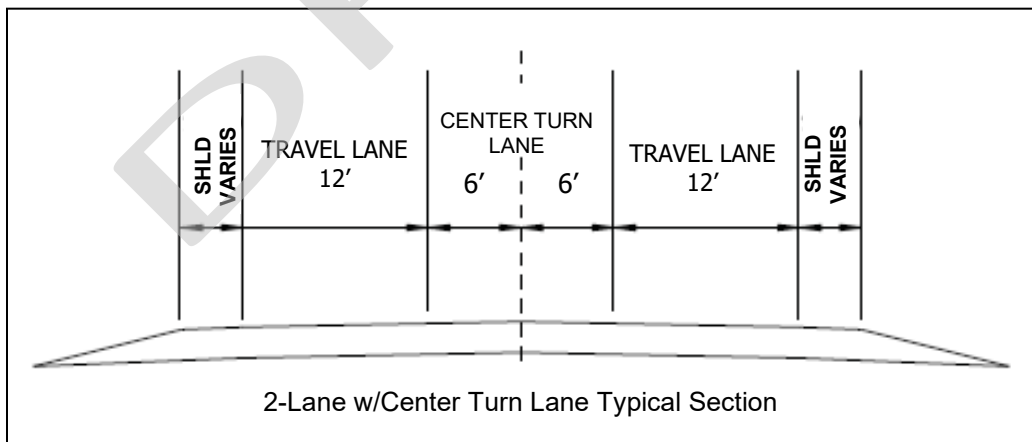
Proposed Typical Section-Interim Build: SR 32 (US 321) from SR 73 to Penland Road
